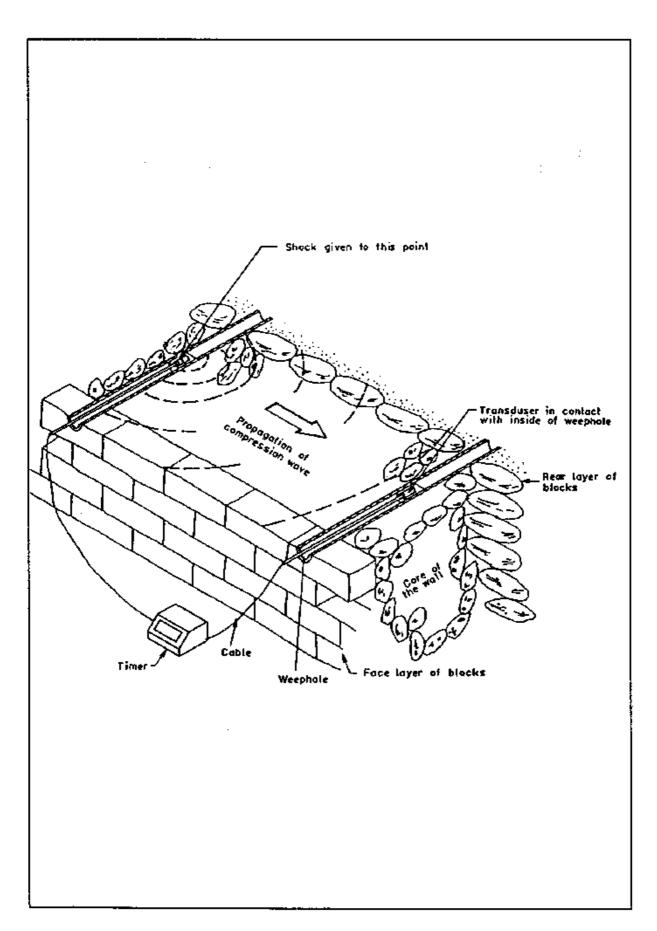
Sectional View Illustrating the Method of Seismic Probing of Masonry Walls
